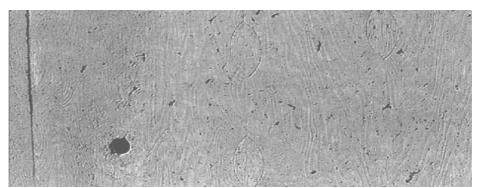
Concrete finish, rough sawn timber sheeting used for formwork
